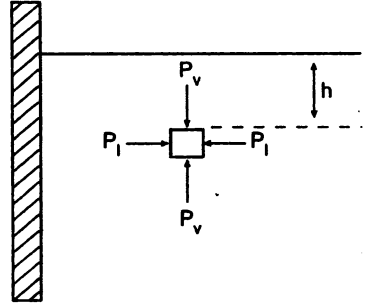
Pressures on an element of soil behind a vertical wall
